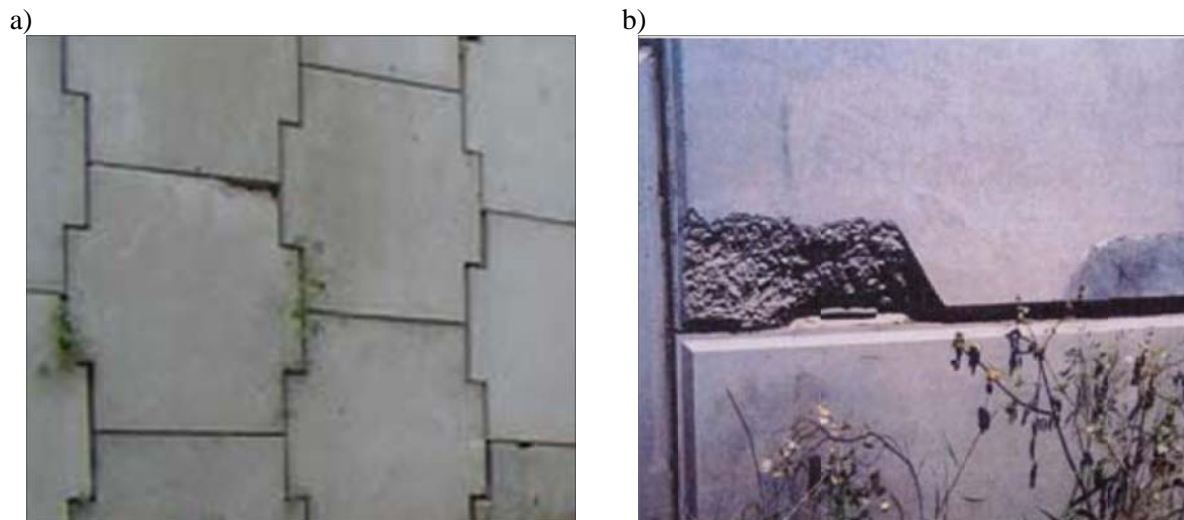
Spalling of concrete panel facing units: a) Thome and Janke (2005), b) Neely (2005).
